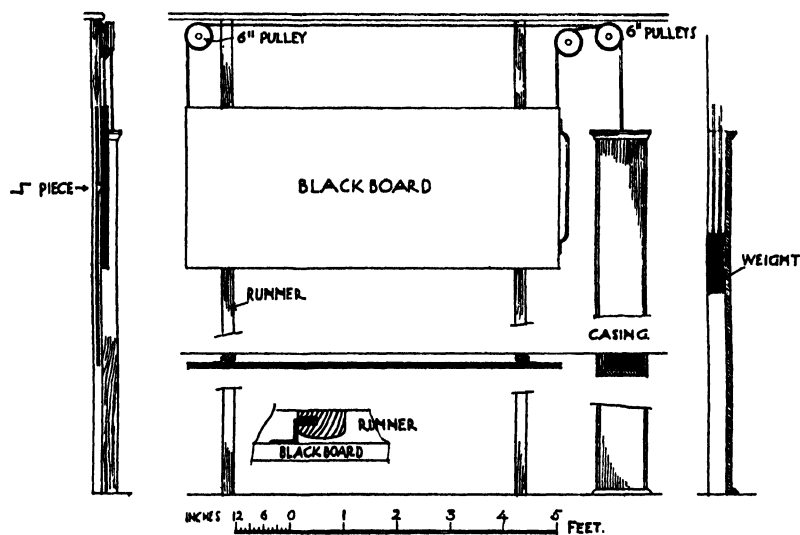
Elevation, Plan, and Sections, Kelvin hung Blackboard.
